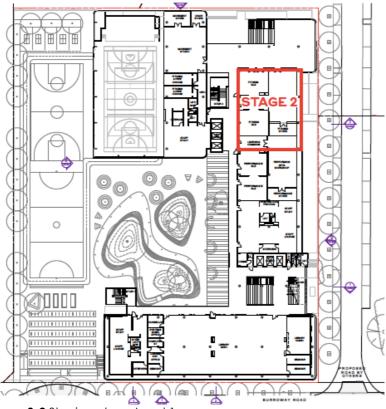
Staging plan – Level 1 Source: Wood Bagot
